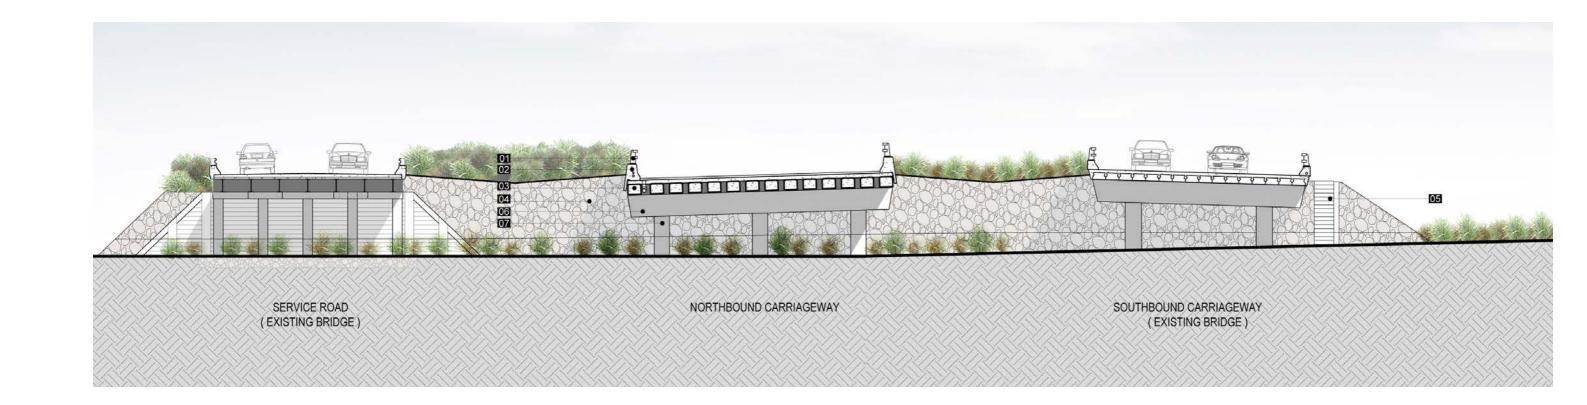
Northbound , southbound and service road bridges over Stumpy Creek: Section
